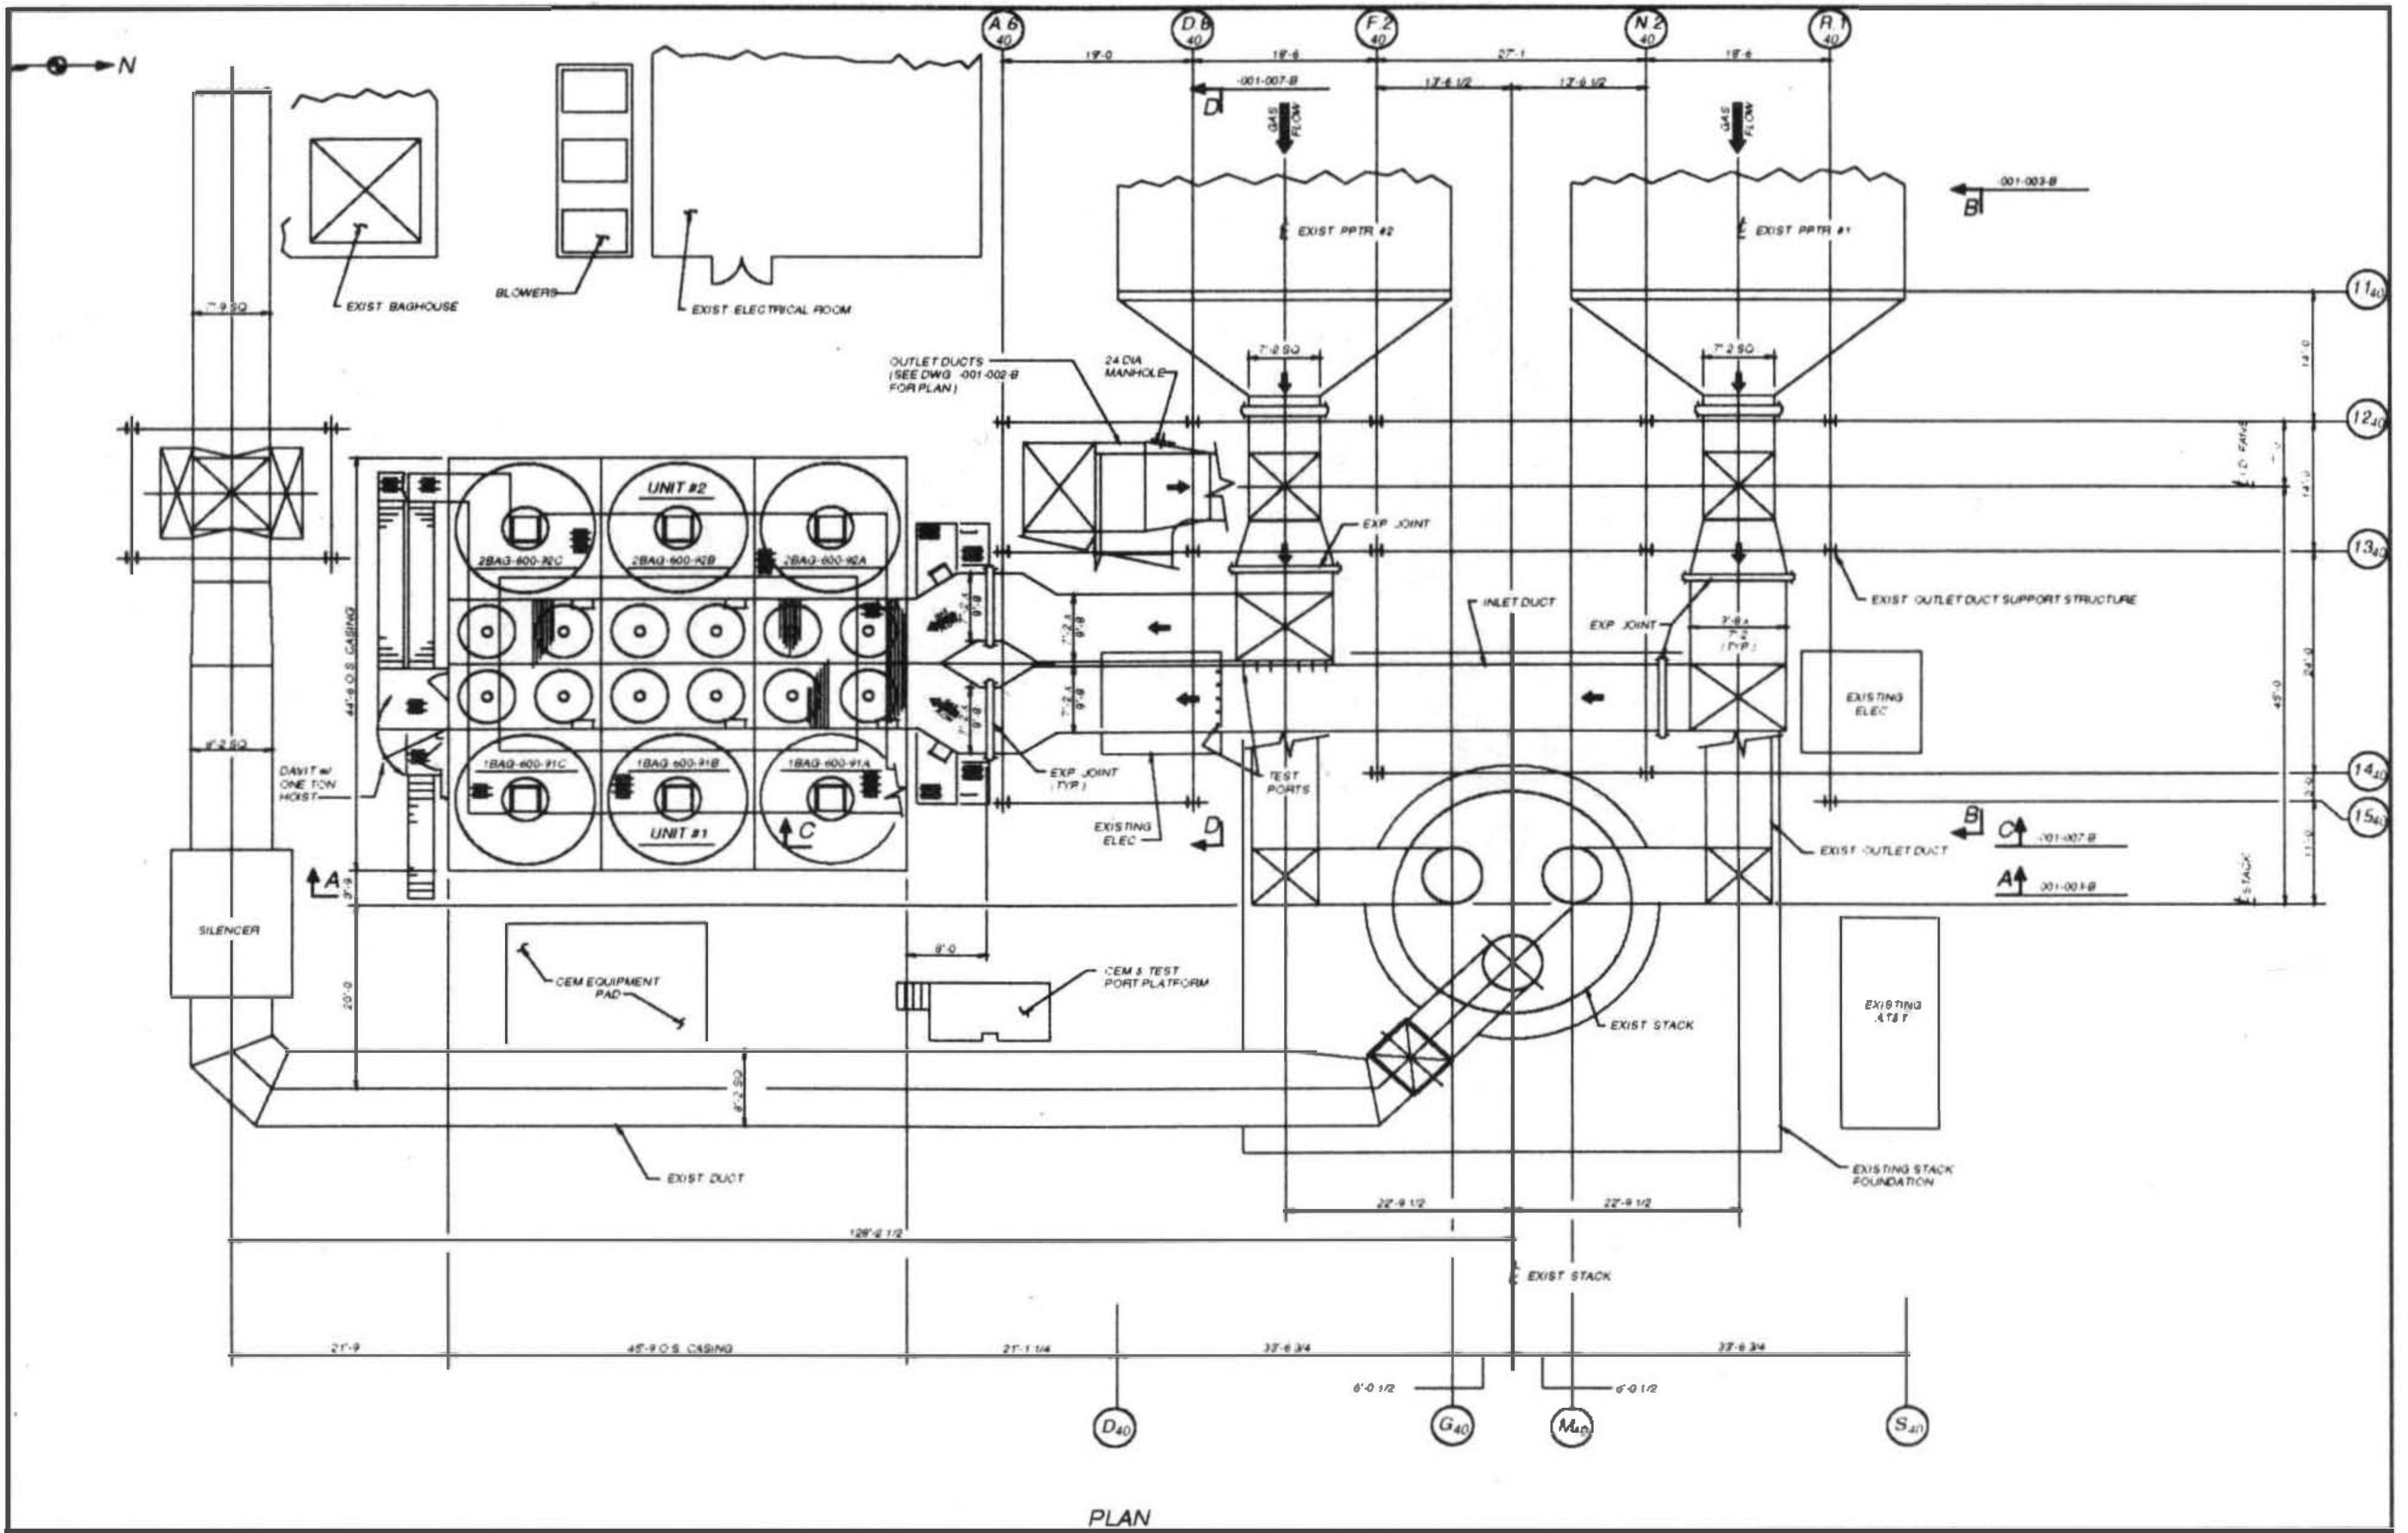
FULL SIZE COHPAC LAYOUT FOR UNITS 1 AND 2
